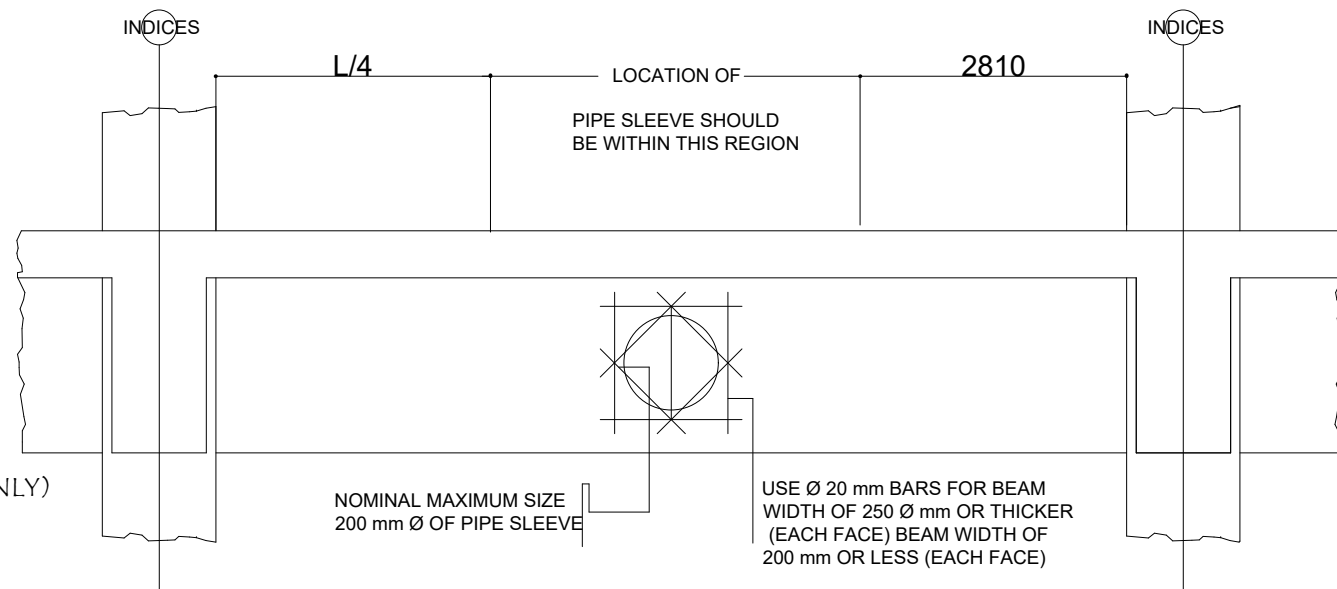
TYPICAL PIPE SLEEVE DETAIL
